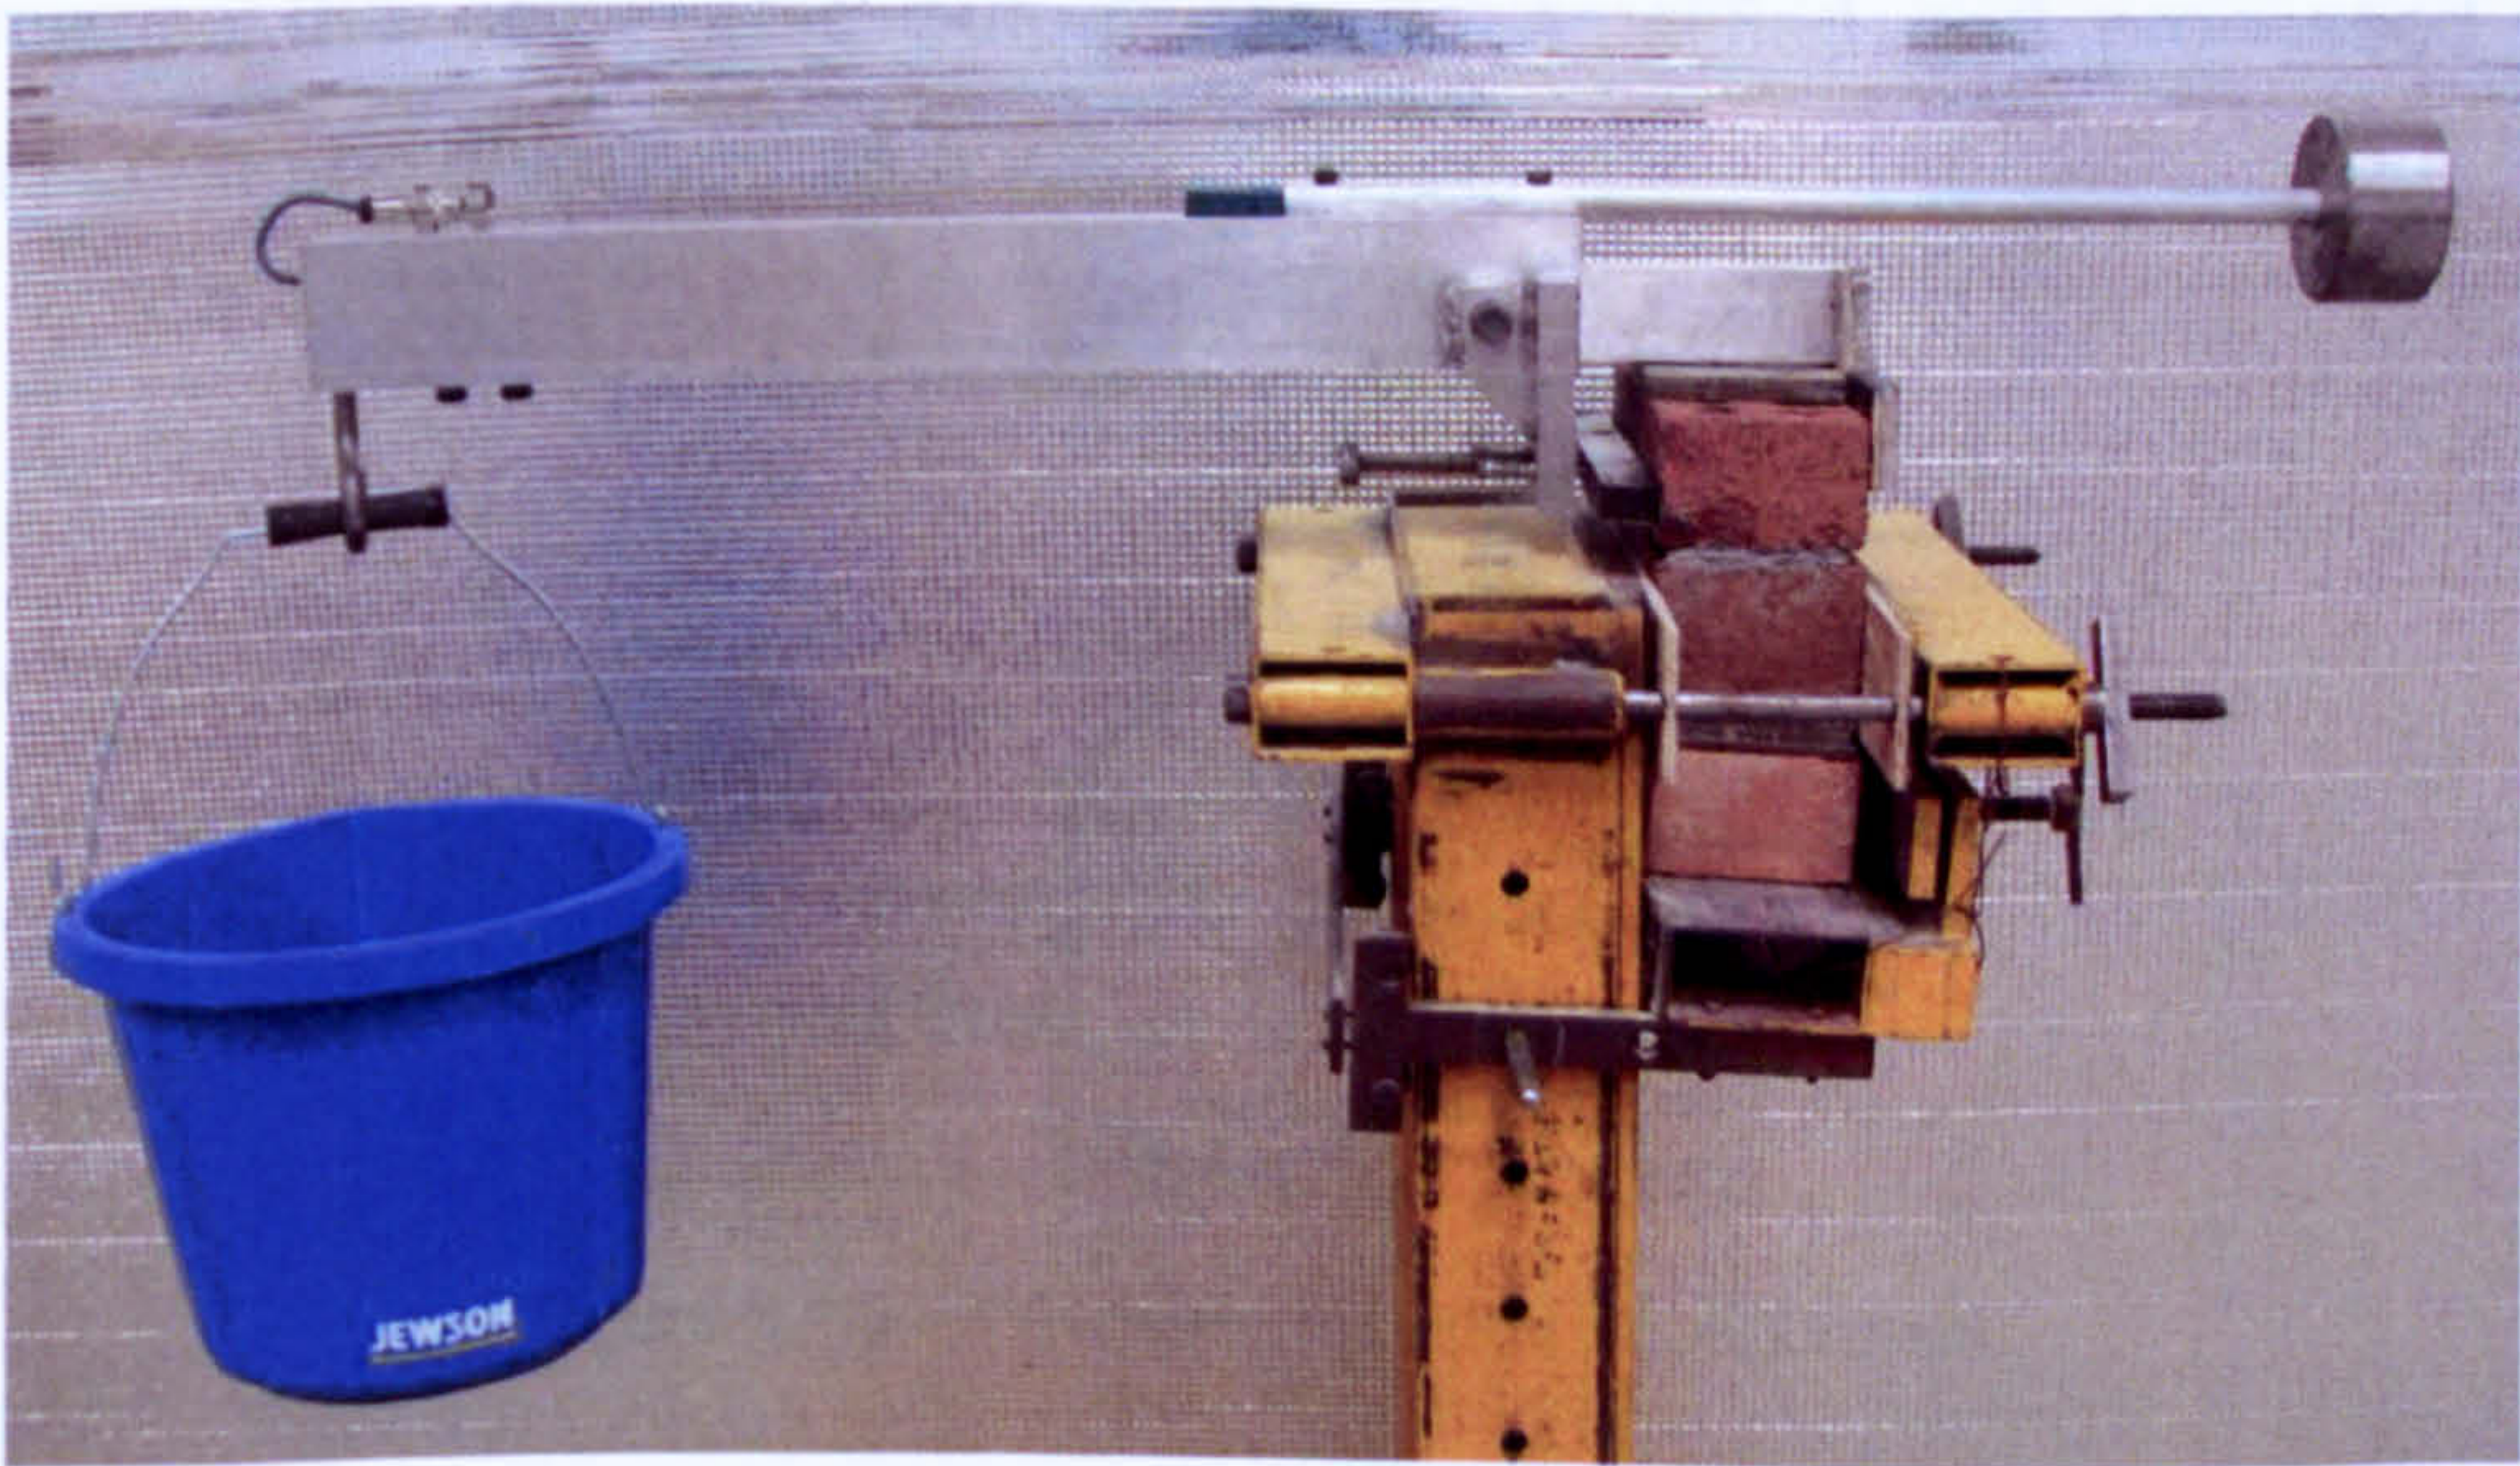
Test being carried out with the Reutter bond wrench
